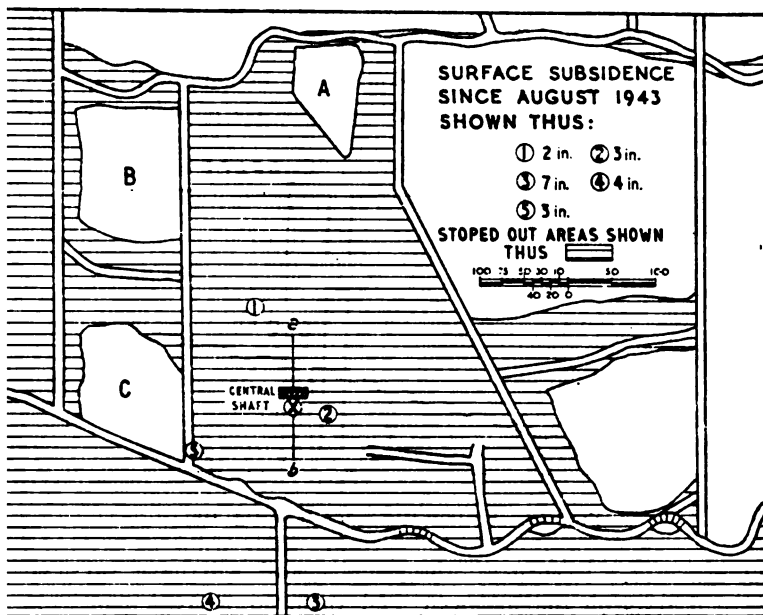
Plan as at 30th June, 1944, to date (25th April, 1946).
